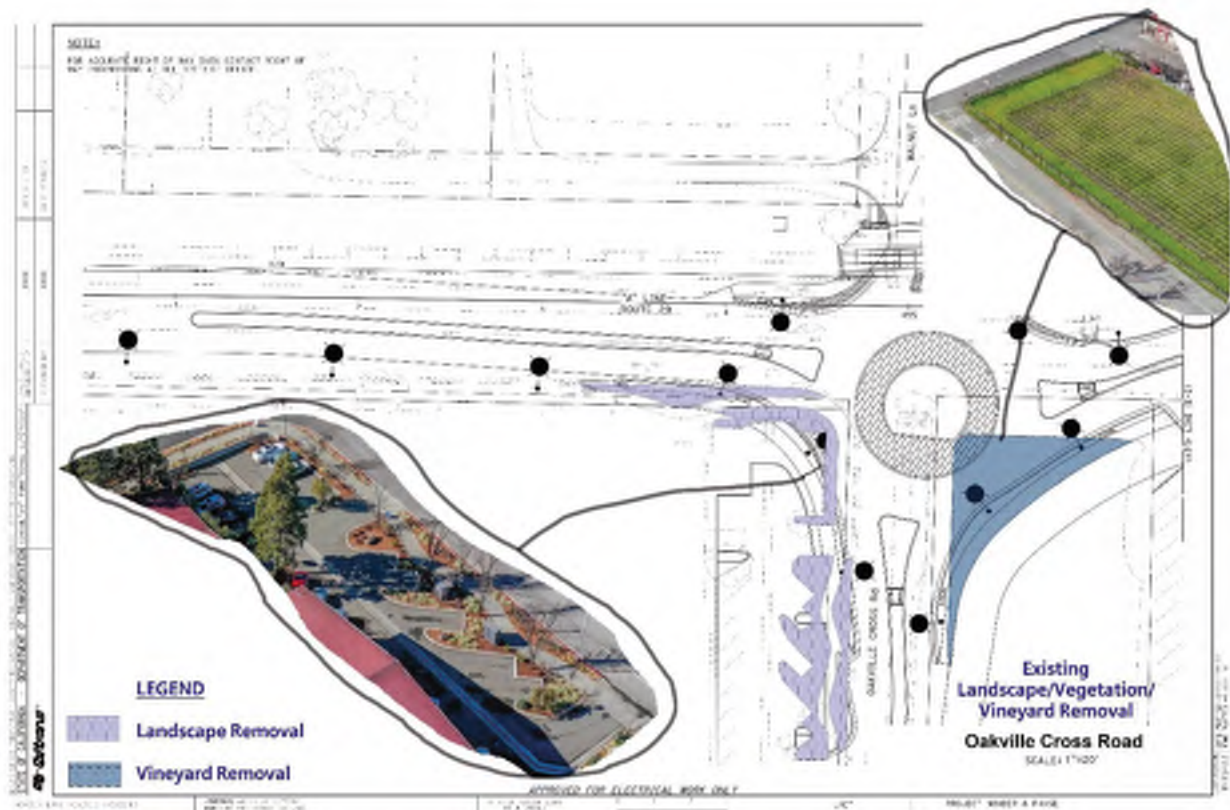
Vegetation and Vineyard Removal at Oakville Cross Road, 2023
